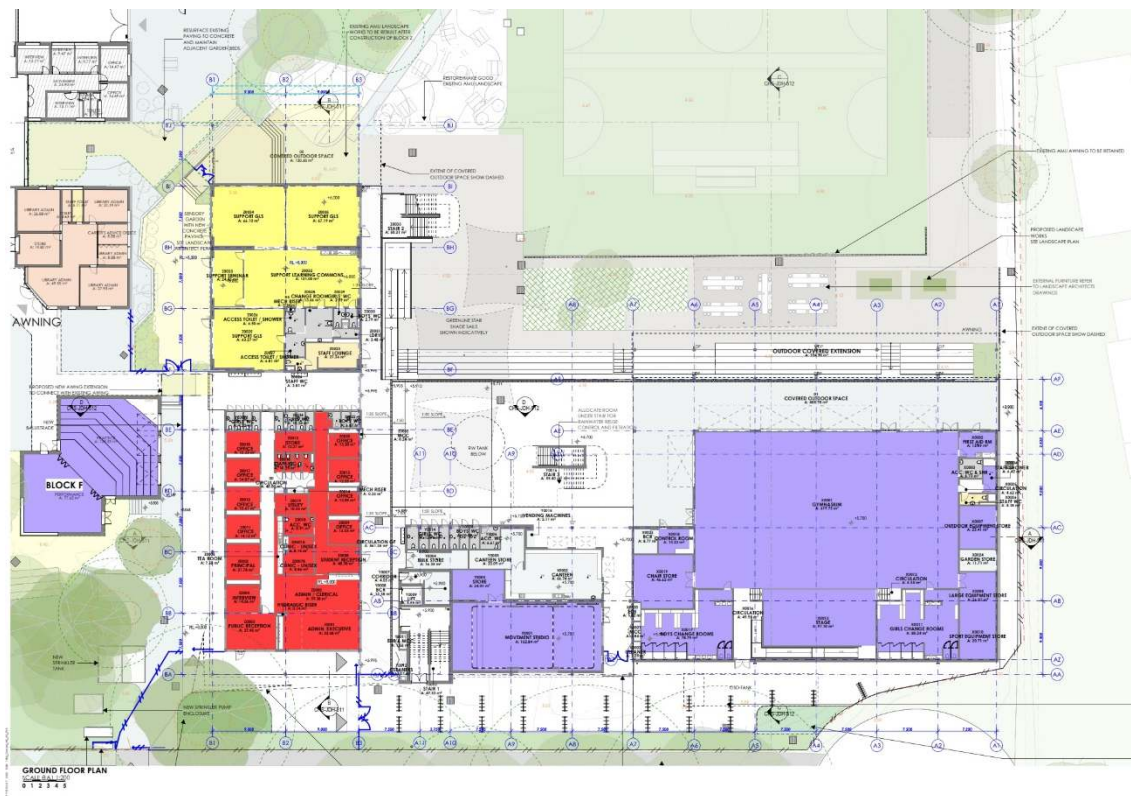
Ground floor plan. *Source:* JDC Architects 2023.
